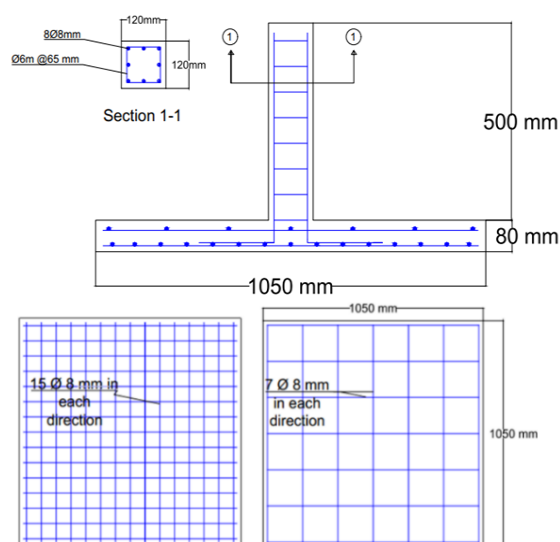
Dimensions and reinforcement details for the column and tested specimens
